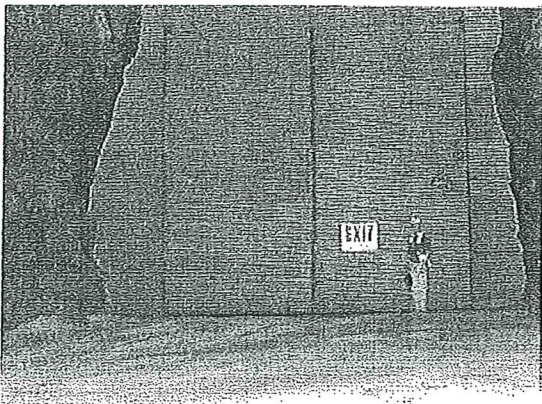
Stopping made for corrugated steel panels reinforced with a steel frame.
